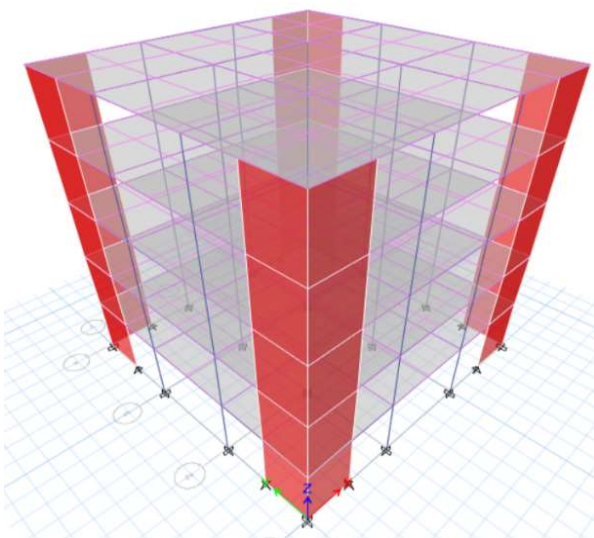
Isometric view of G+5 storied RCC Building with Shear Wall
